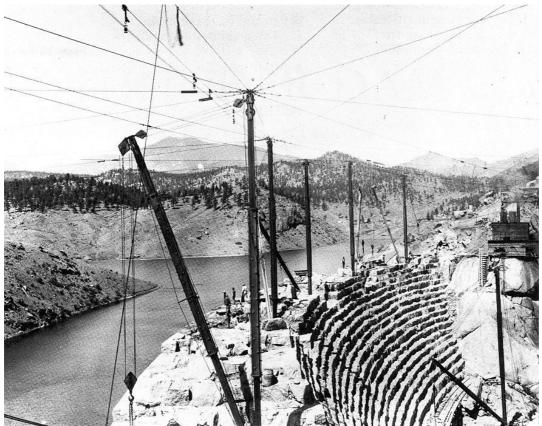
View of Aerial Tramways During Construction of Cheesman Dam.
